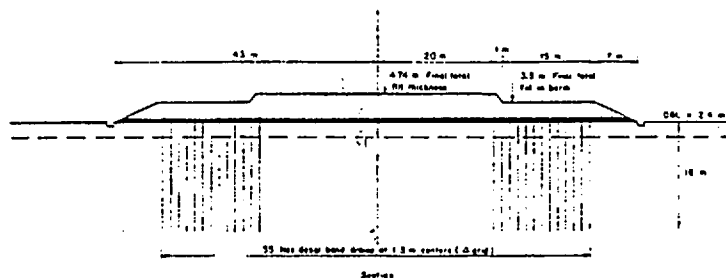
Cross Section through Centerline of Embankment with Vertical Drains
